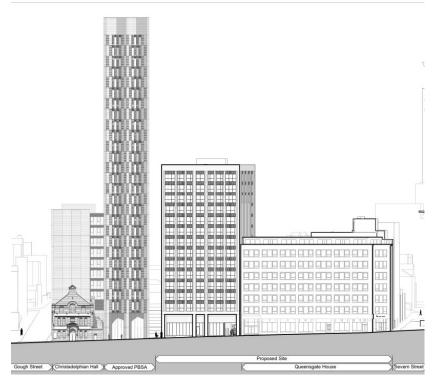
Street elevation of the locally listed former Christadelphian Hall, approved PBSA tower, the proposed scheme (Block A) and Queensgate House.
